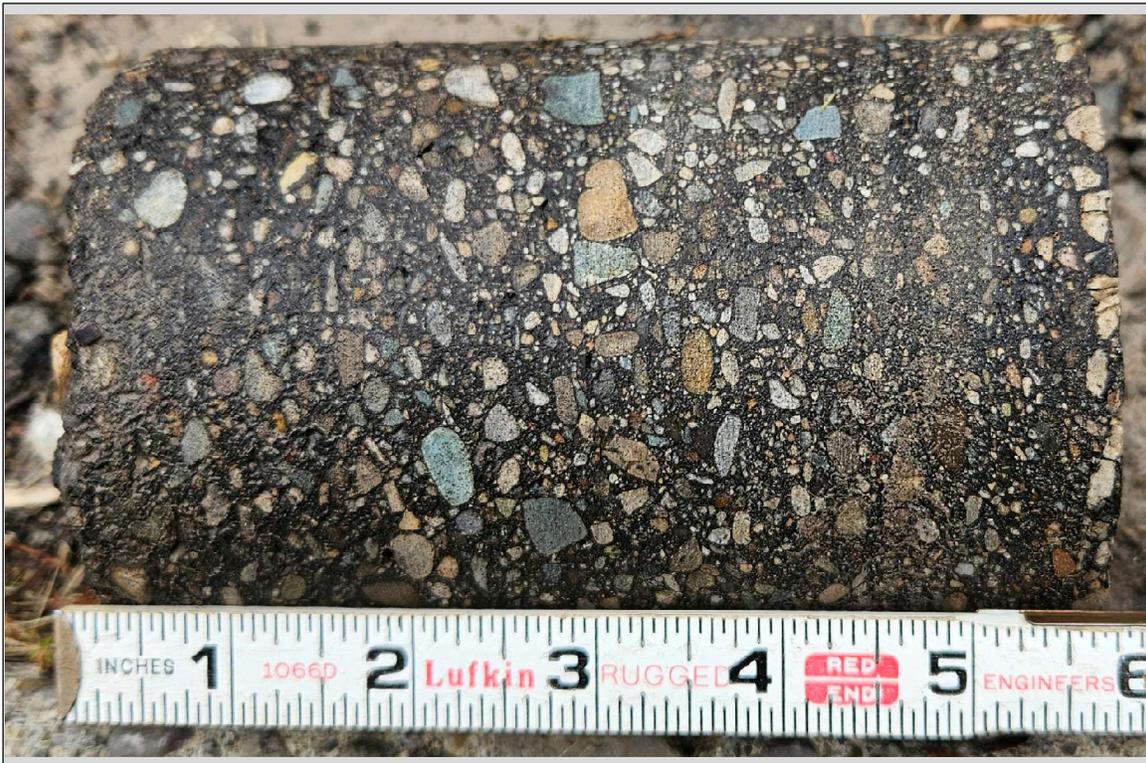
SB-2026-111 (Arbordale St.): 5.5-inch Asphalt
